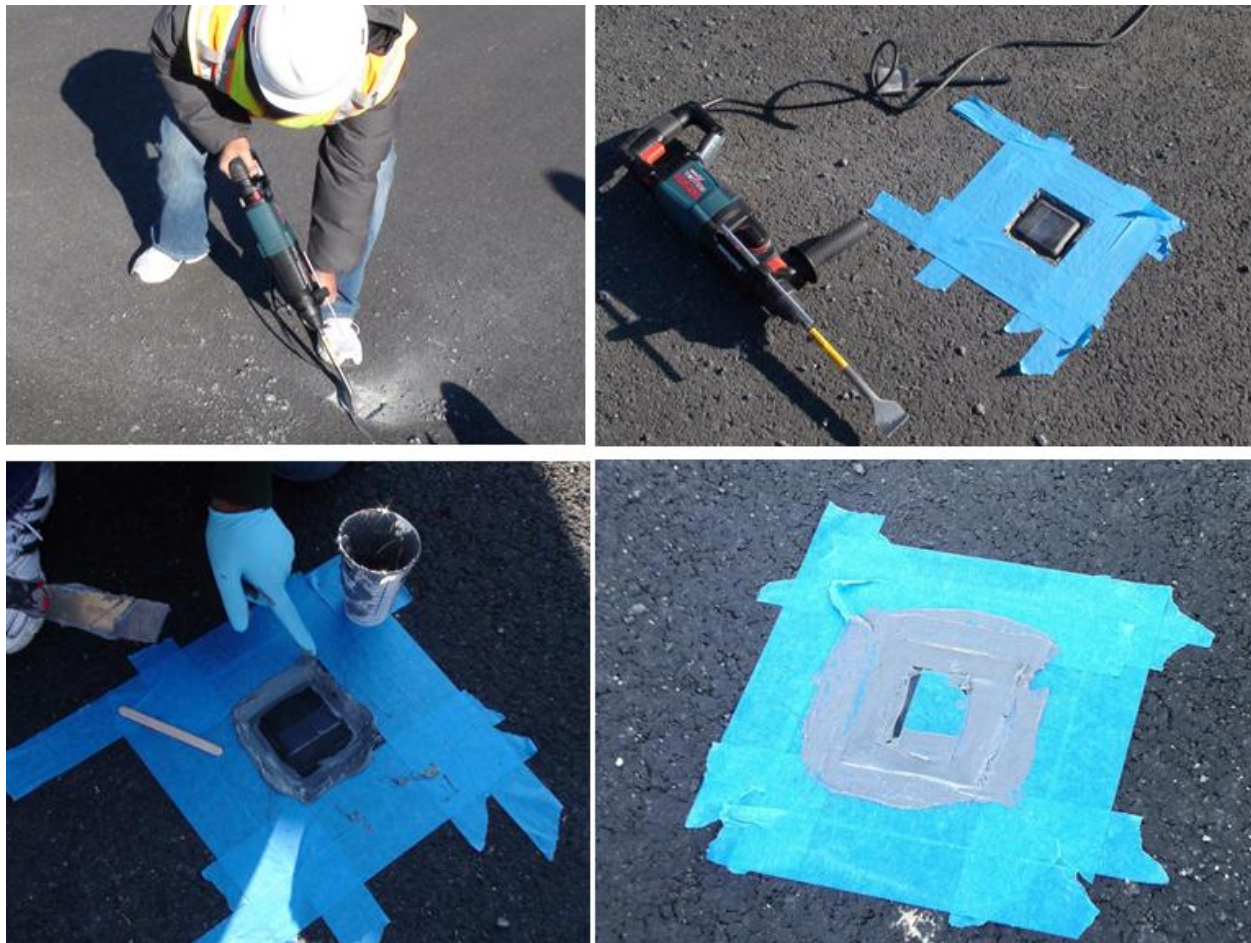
Installing wireless traffic sensors on the Inter County Connector pavement
